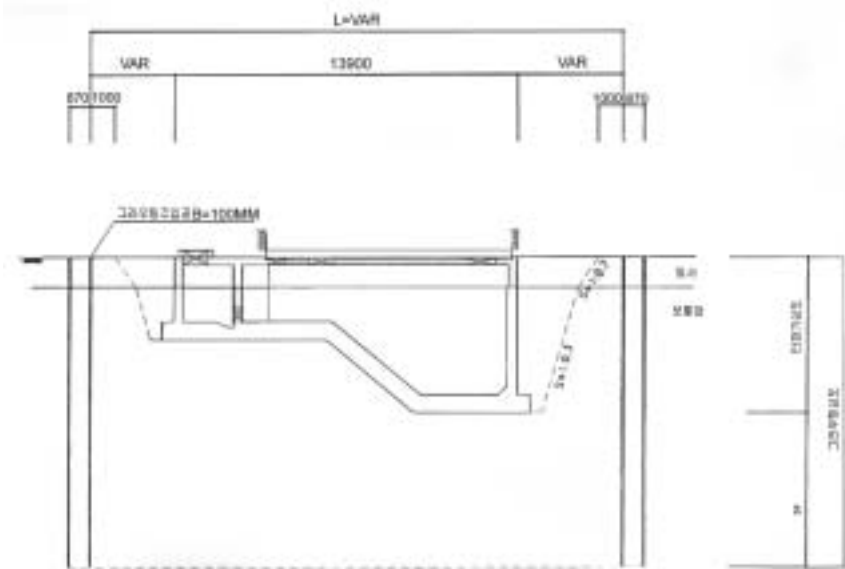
Sectional Plan of Pumping Station(Jo-chun)
